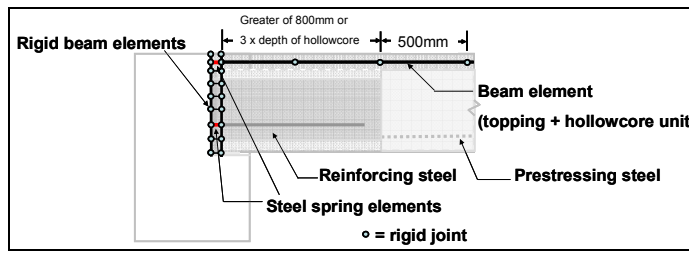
Schematic of multi-spring connection model for continuous connection detail
